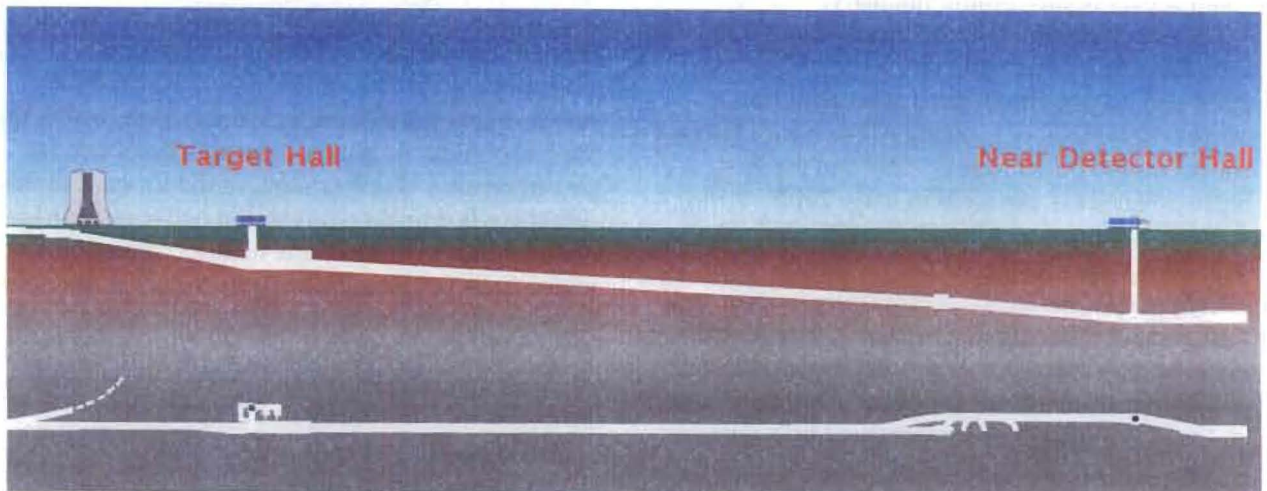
Plan (bottom) and elevation (top) views of the NuMI beam line.
